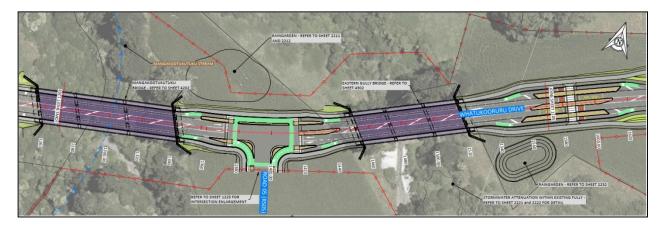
Mangakootukutuku Bridge and Eastern Gully Bridge Geometric Layout
